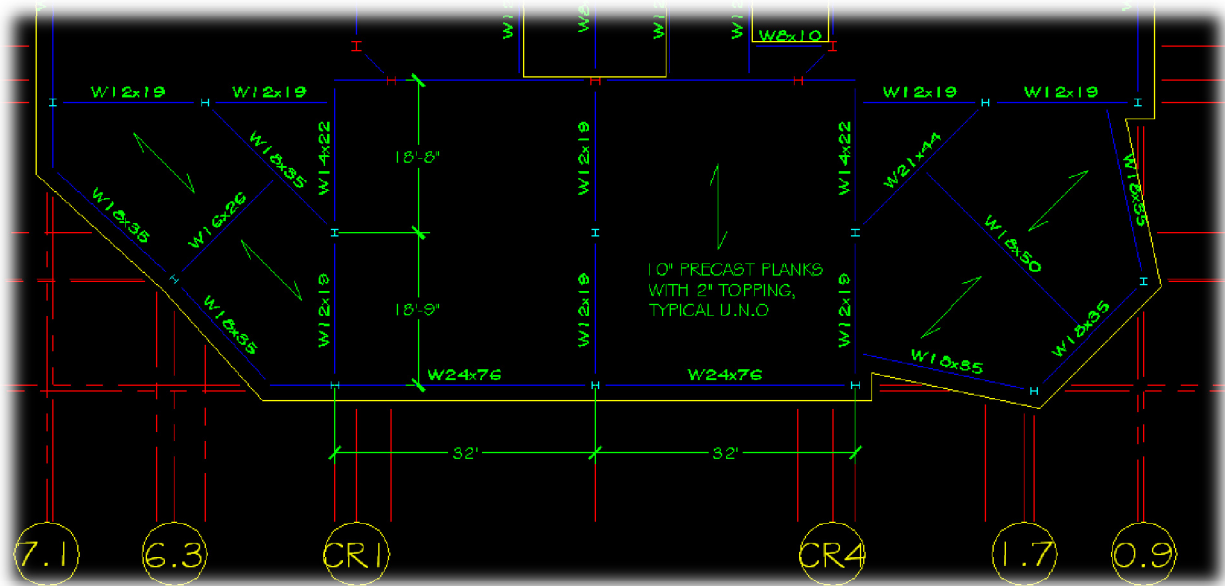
Typical Bay Steel Frame and Plank Framing Plan
